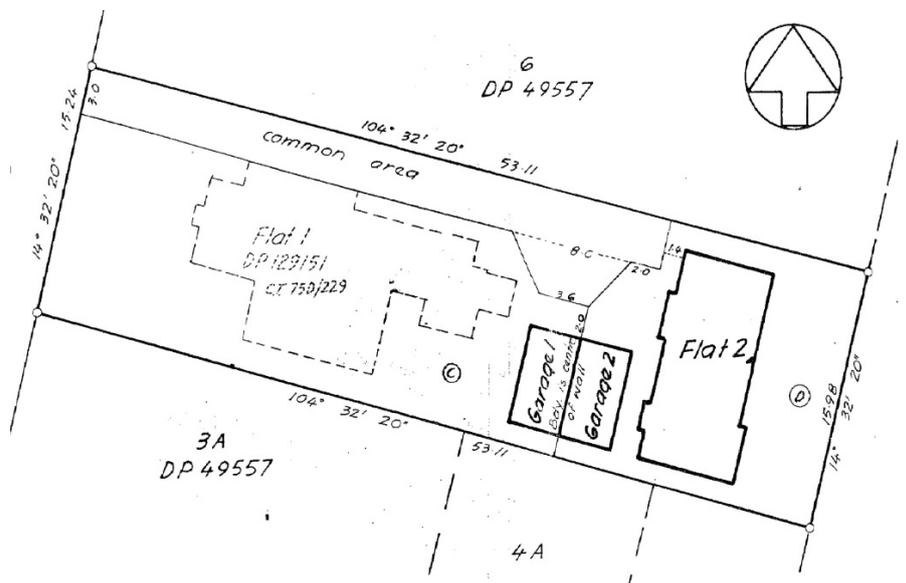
Site plan (from plans dated 1989) (Not to scale)
